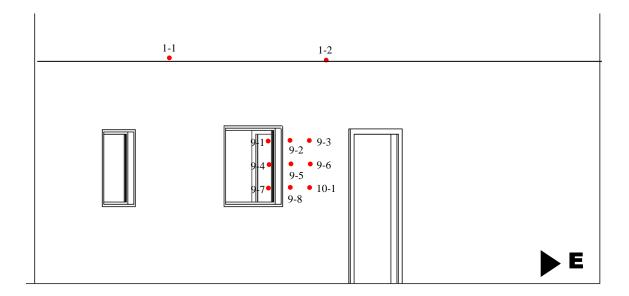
TC on N wall balloon frame and TC tree hanging out on west of LBR window
